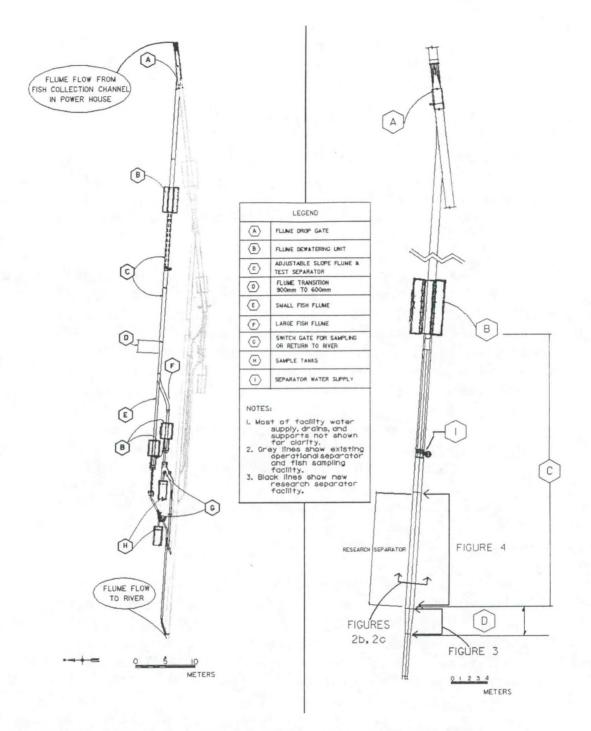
General plan view of the test separator system and existing fish separator/sampling facility (shown in grey on left) and enlarged plan view of new test separator system at Ice Harbor Dam. Flow is from top to bottom in each figure.
